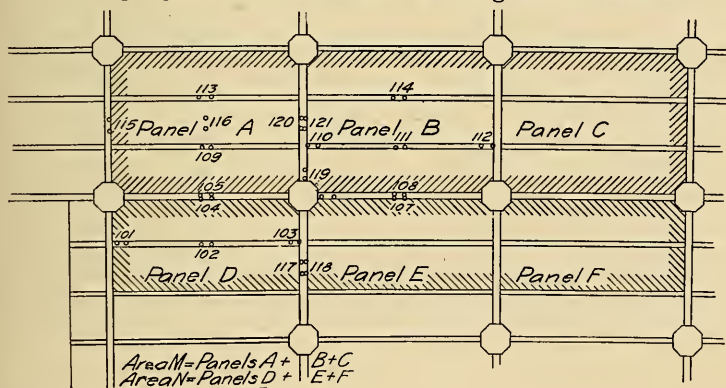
PLAN SHOWING LOCATION OF GAUGE LINES ON UNDER SIDE OF FLOOR.
